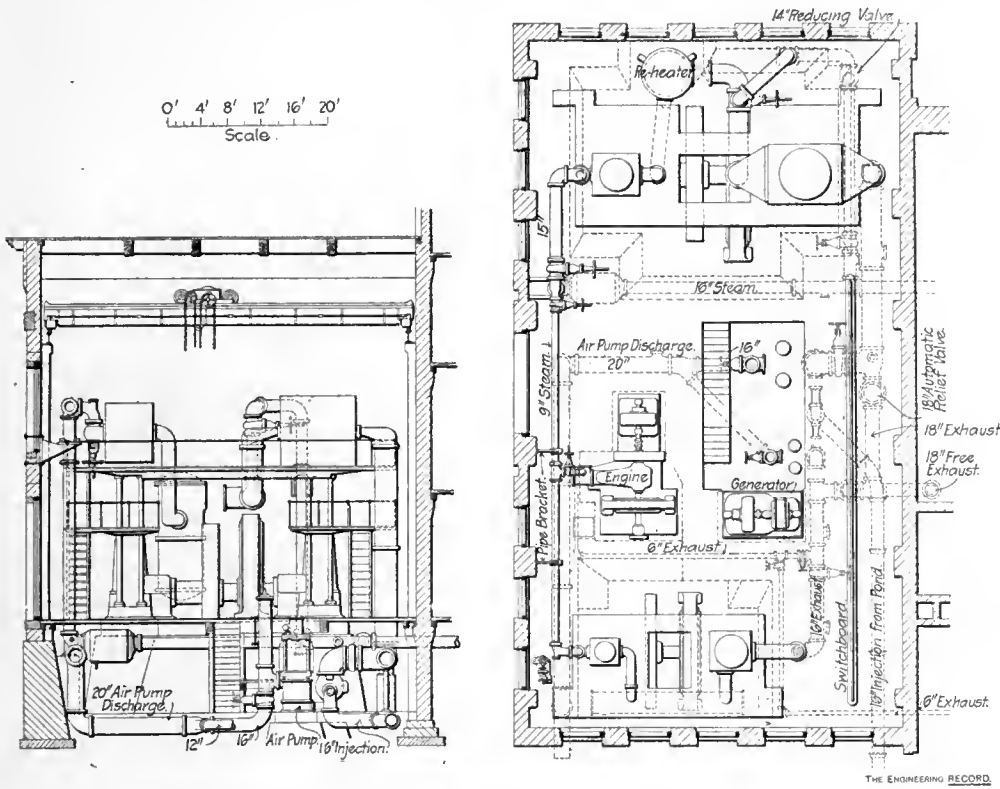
PLAN AND SECTIONAL ELEVATION OF THE ENGINE ROOM.
